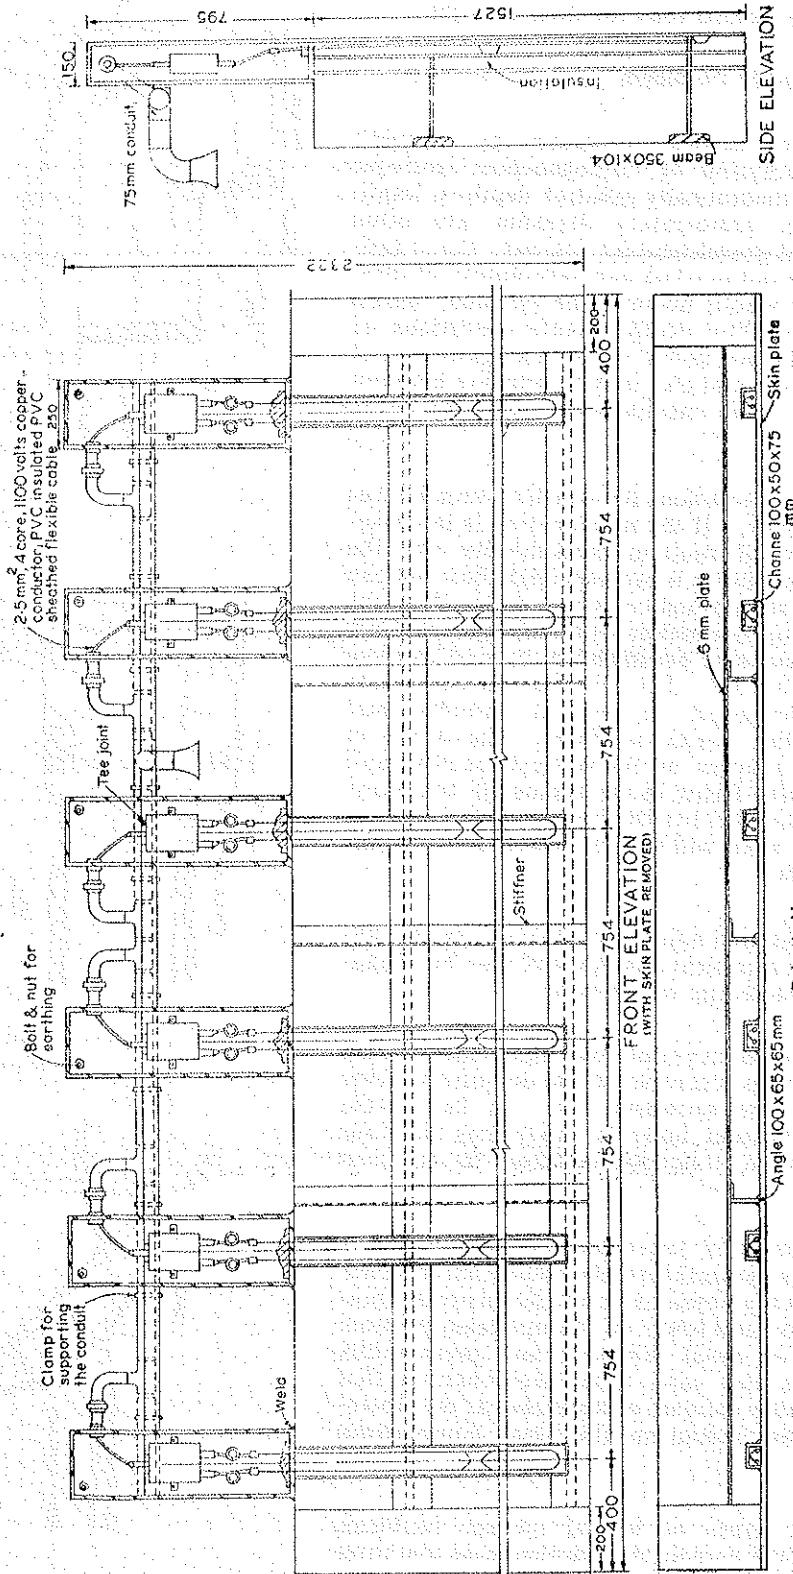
Typical Details of Gate Heating Arrangement.
